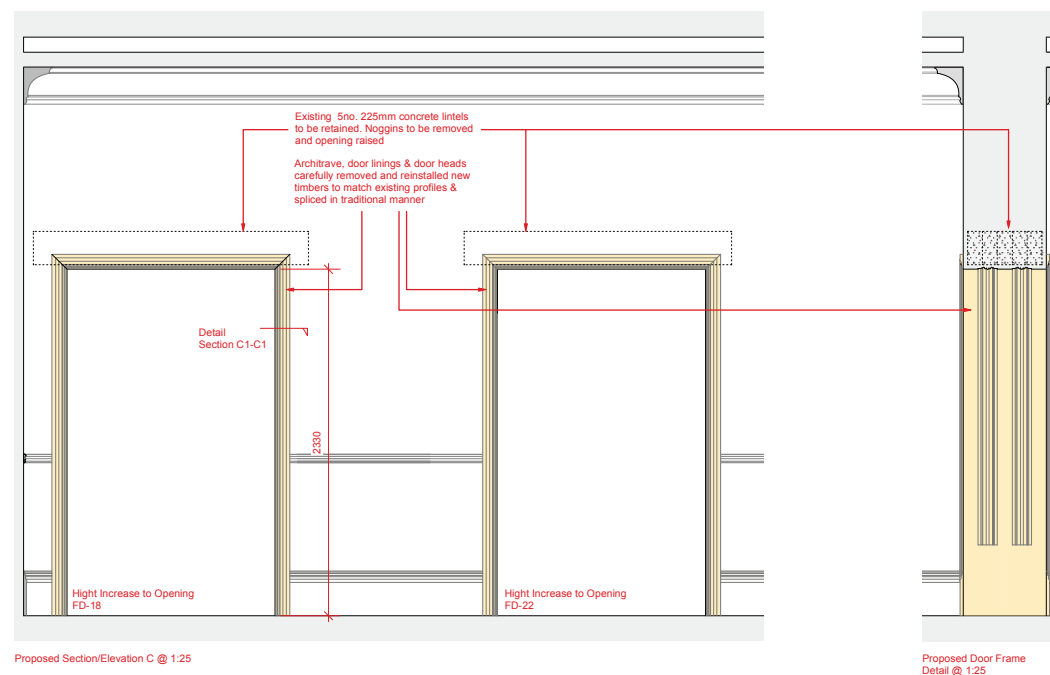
Proposed Elevation C - Flat 2, 5 Cambridge Gate
